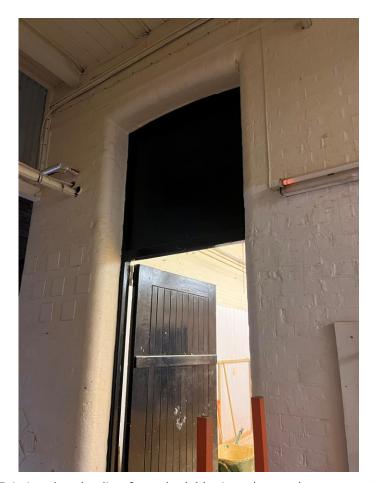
Existing door leading from the lobby into the southern room with currently blocked fanlight above
